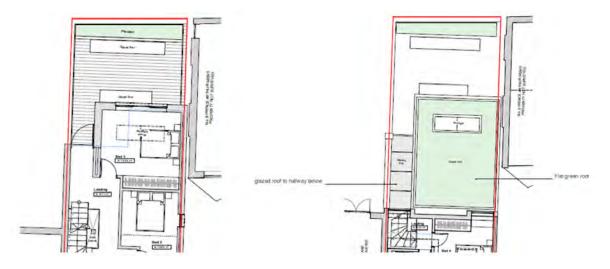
Proposed First Floor (left) and Proposed (rightRoof Plans
